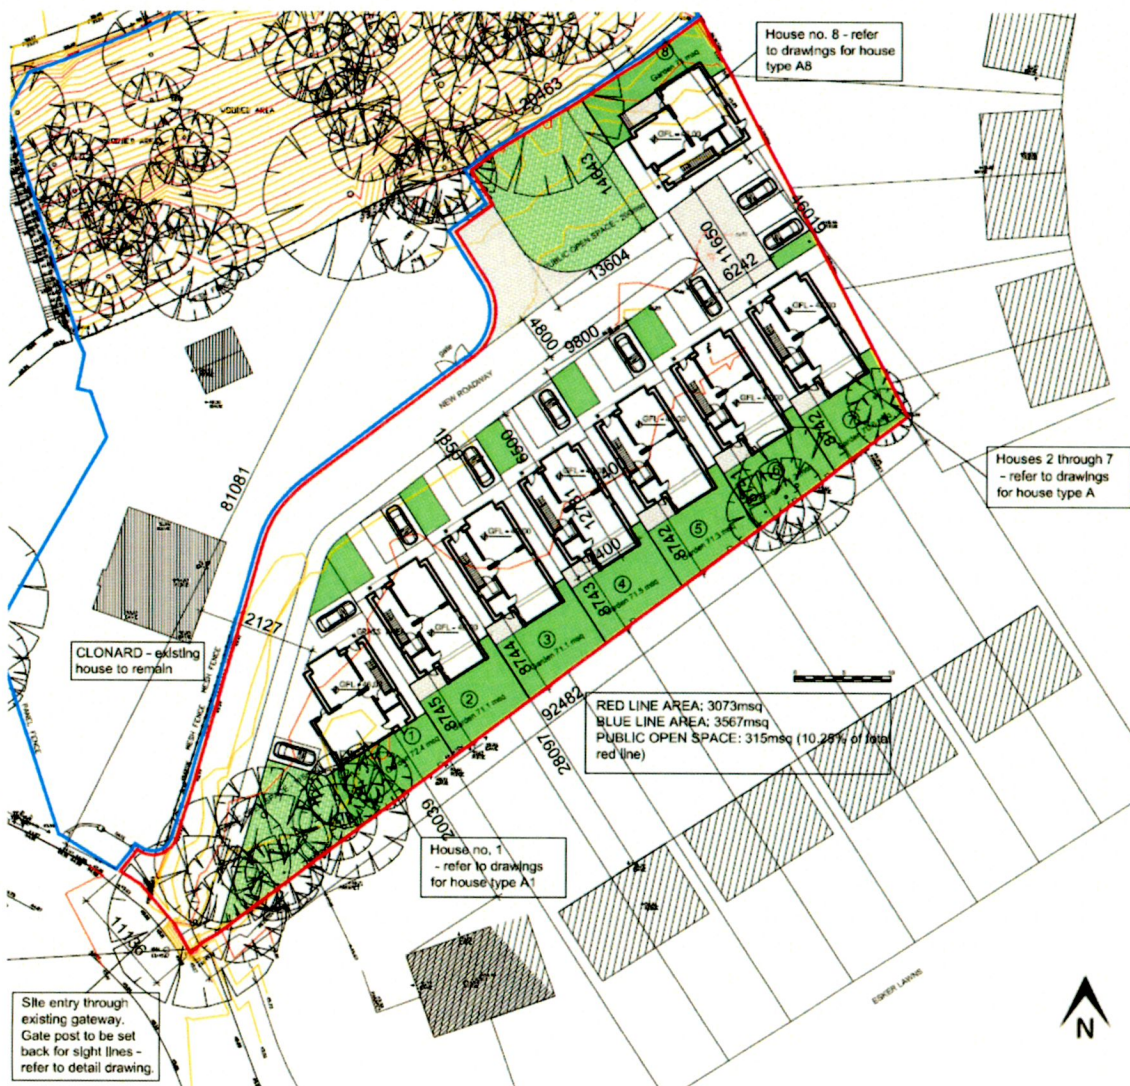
Extract from site layout plan submitted for permission under Ref. SD21A/0026.
